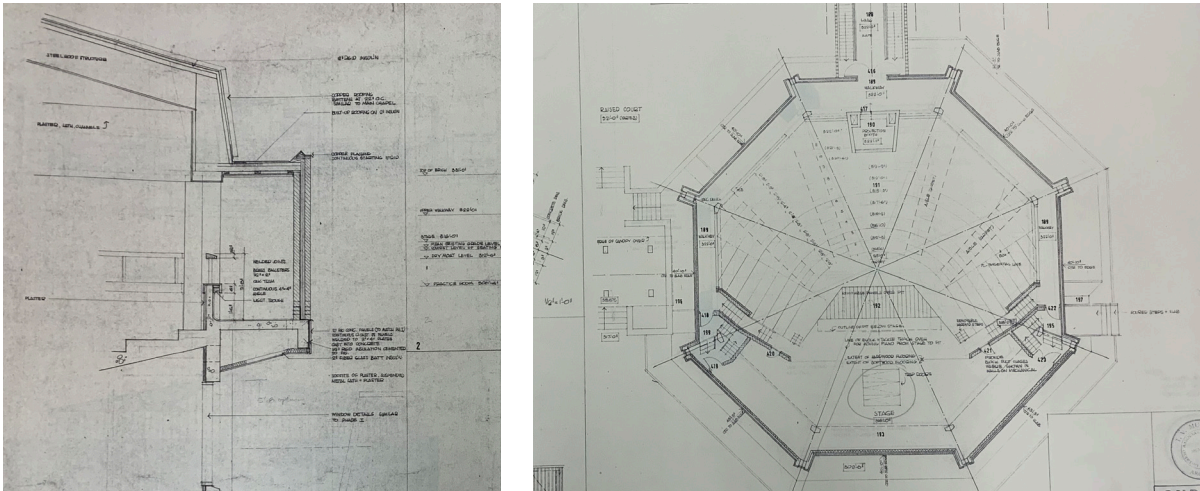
Building F, detail section and first floor plan (T. V. Murray, 1964).
